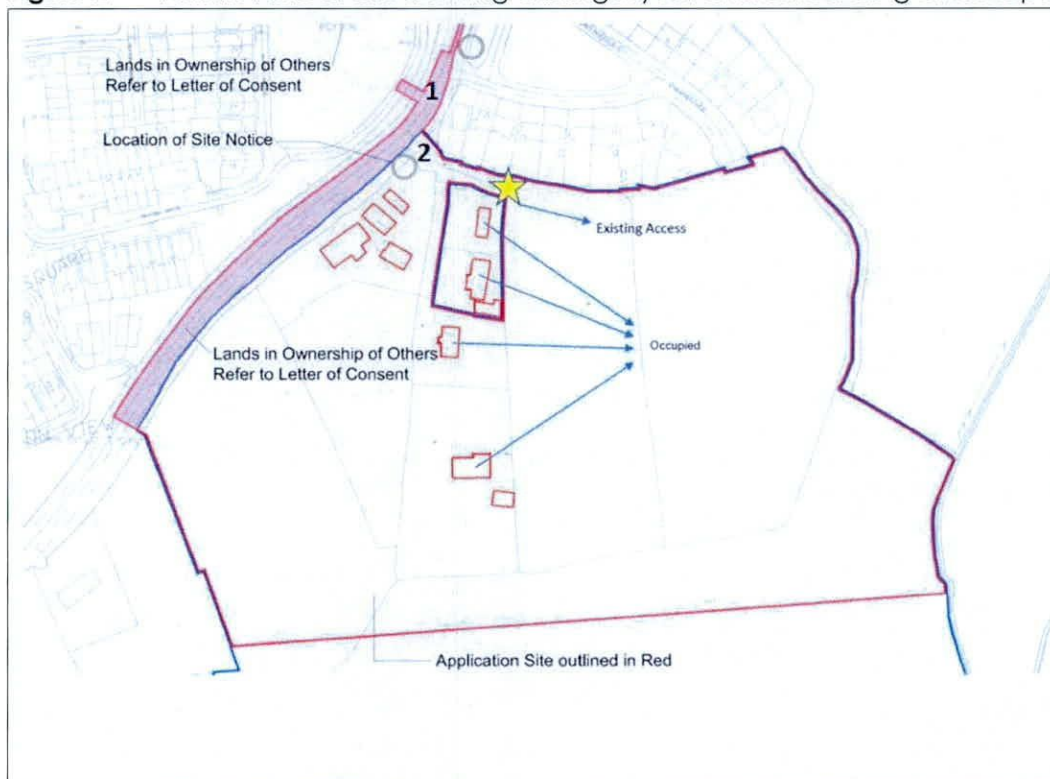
Existing Schematic Site Layout showing locations of Buildings onsite.
